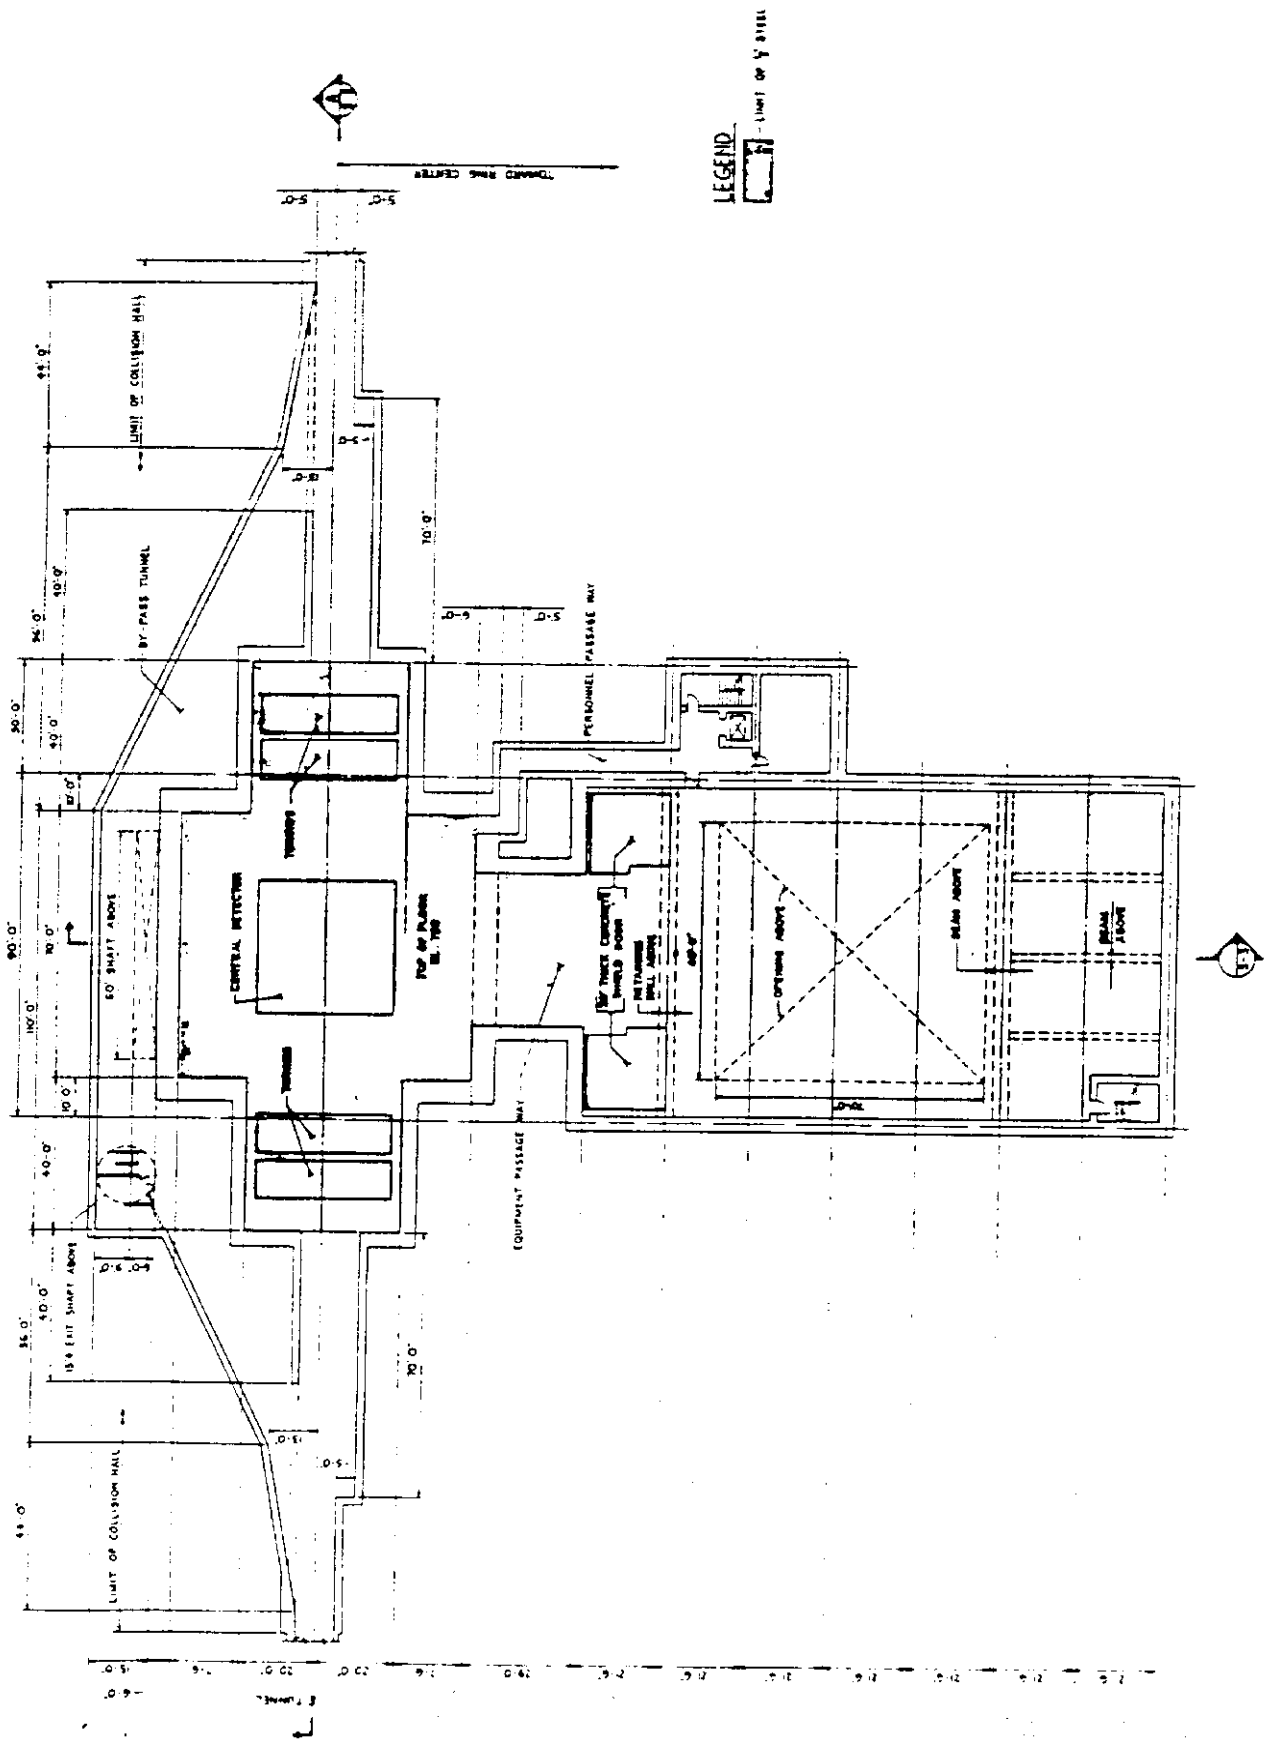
Plan View of Type A Interaction Region showing collision hall, access way, shield doors, assembly area and Staging Building.
